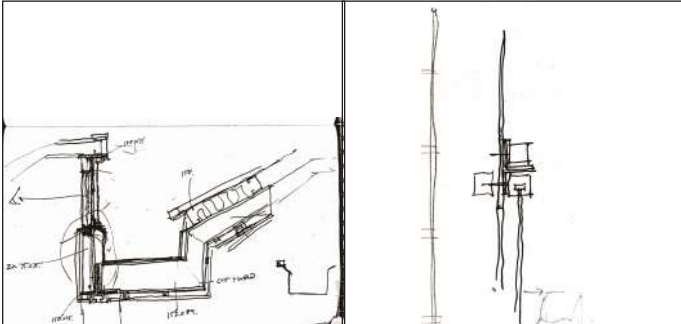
Multipurpose sports centre gutter and glazing detailing (Author: 2019)
